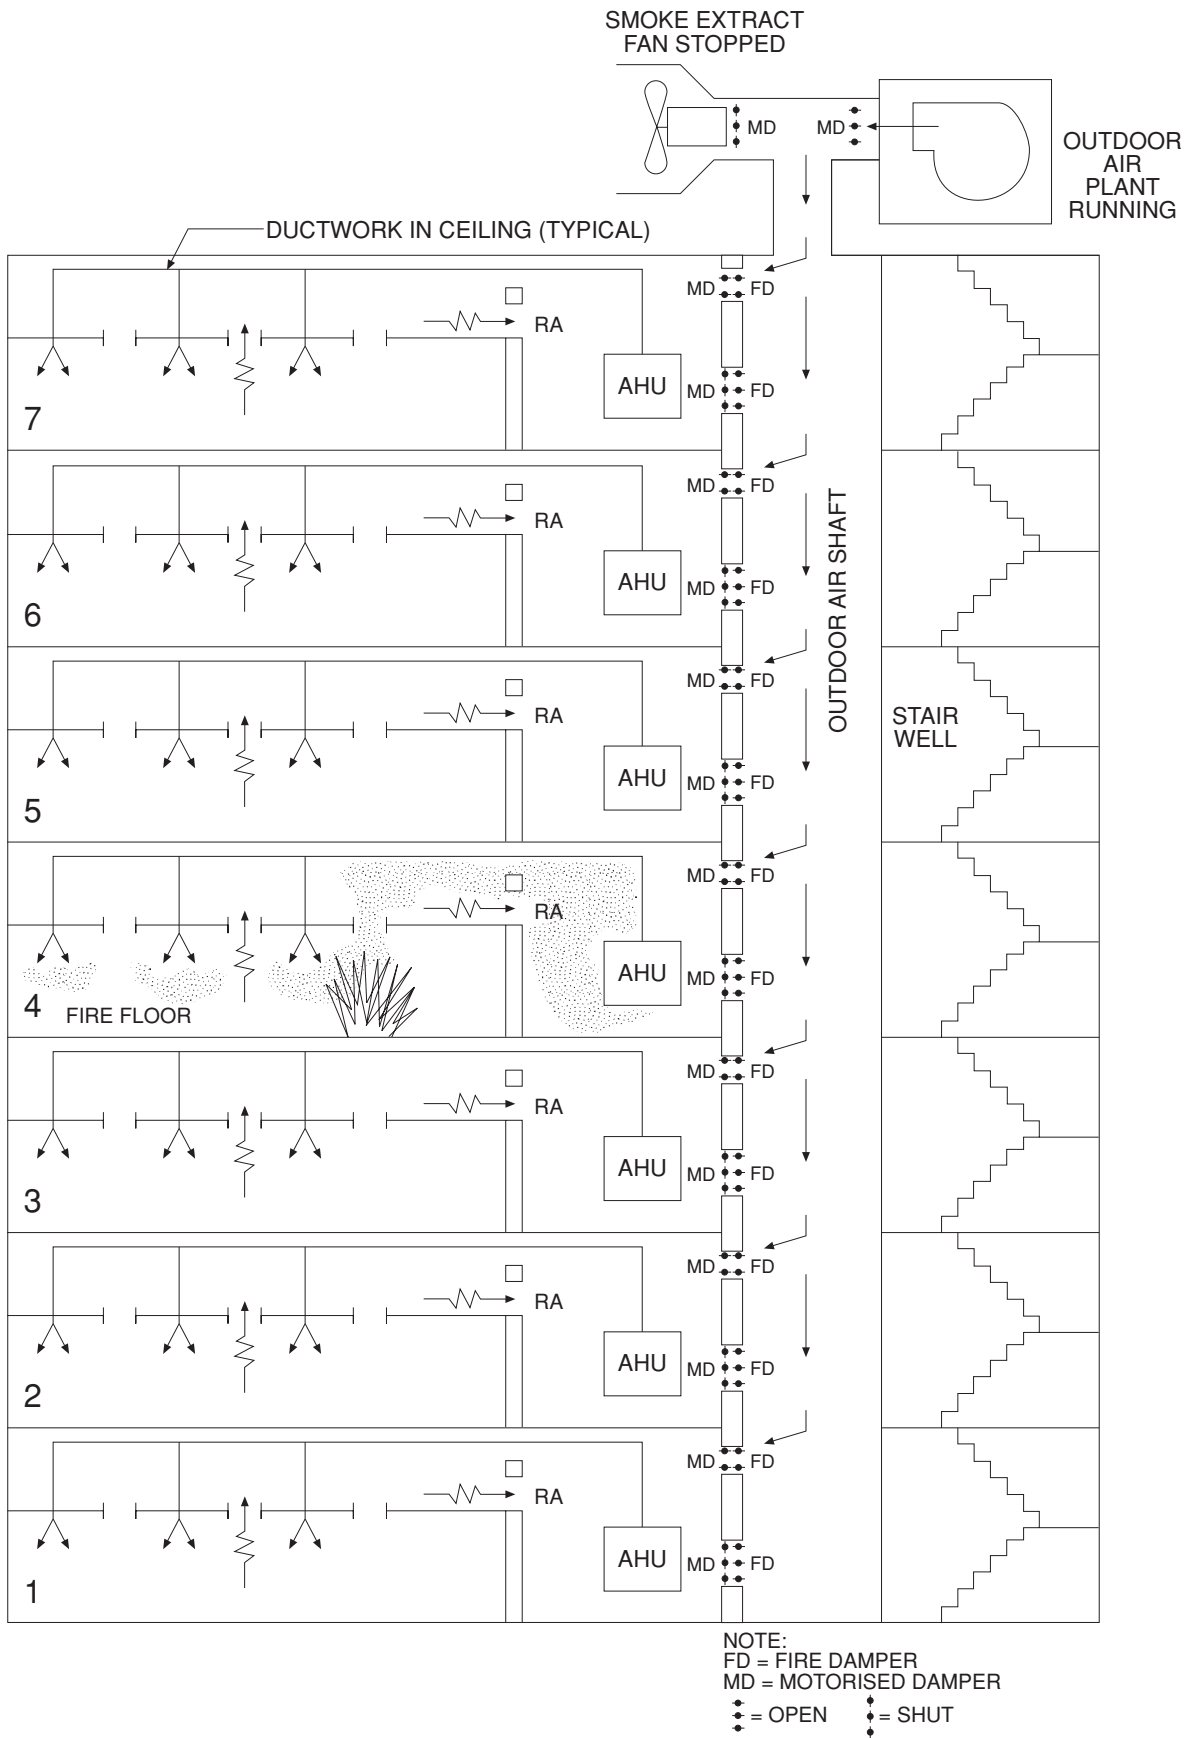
Typical floor-by-floor HVAC, on-floor AHU
